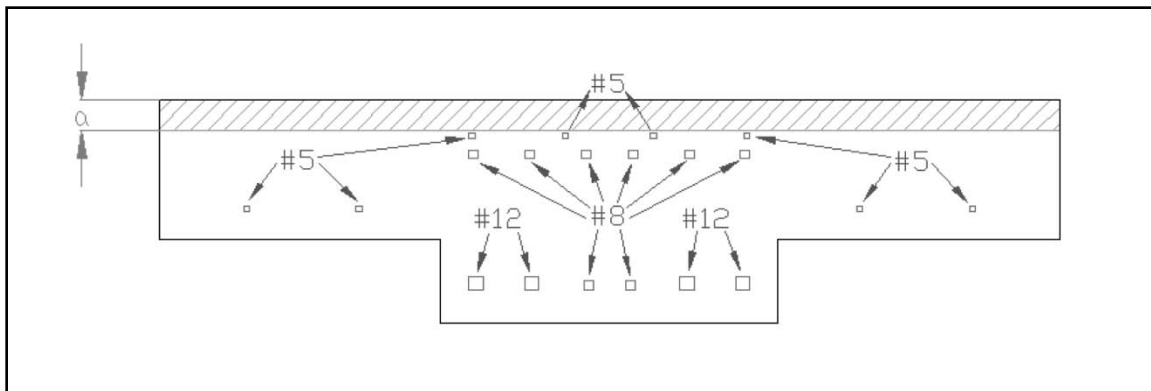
Cross section of the interior beam at mid-span with steel rebar size.
